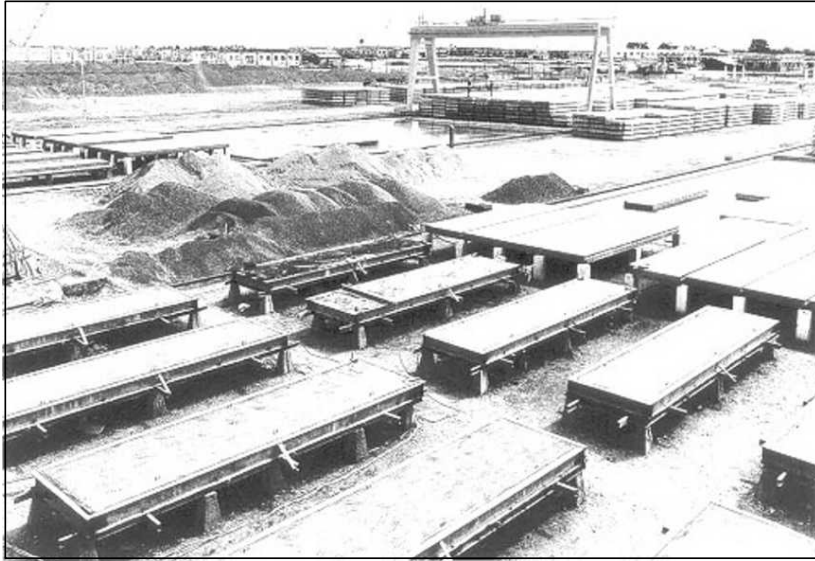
Steel Moulds for Precast Trough Slabs.
